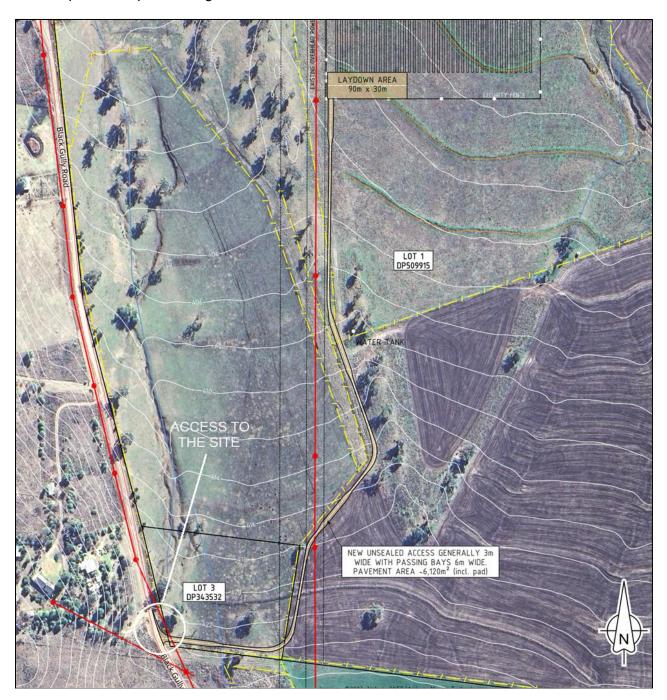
Site Plan showing proposed access to the subject site from Black Gully Road
